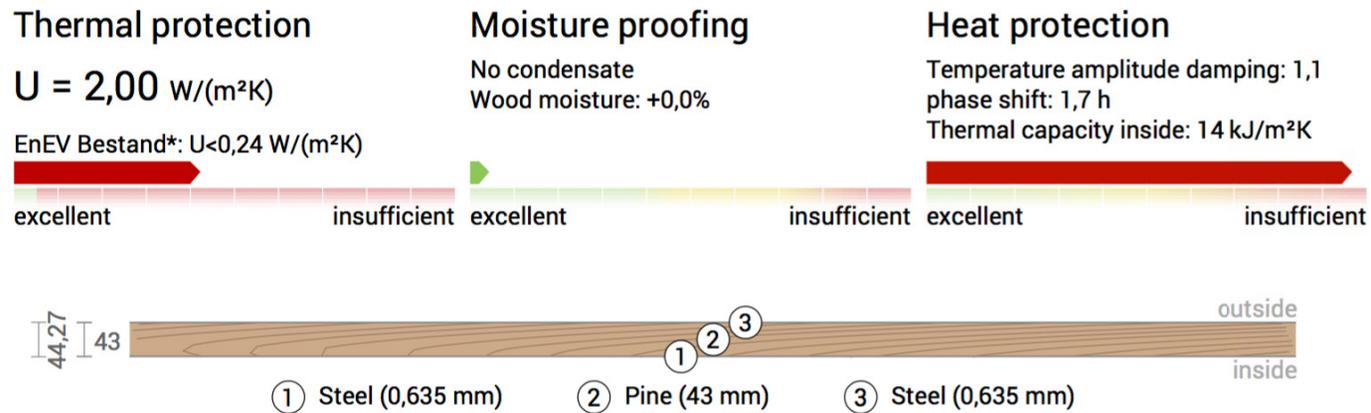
exterior door. The U-value for the original exterior non-balcony Kalamein doors could not be found, and it was subsequently difficult to find a U-value for steel-clad solid wood core door, so this was modeled in U-wert. The balcony doors were modeled as windows in designPH due to their frames and amount of glazing. Source: U-wert.net.
